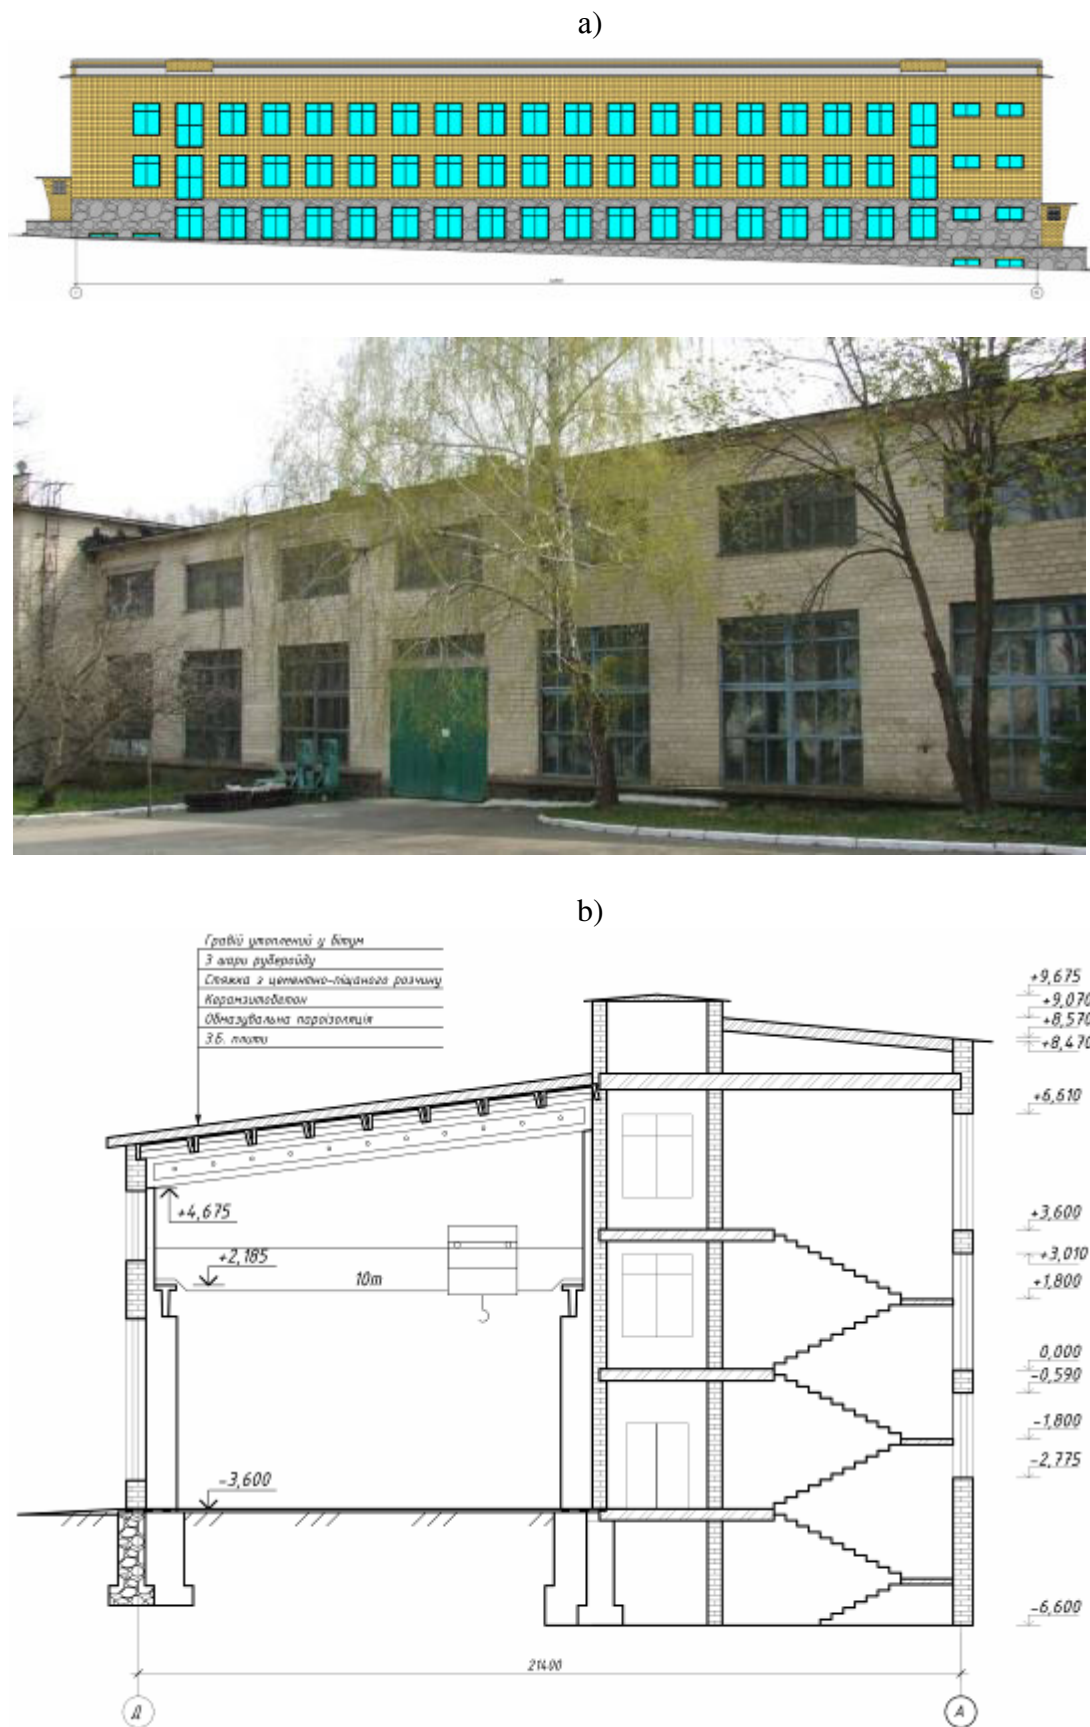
Front elevation and overall view (a) and sectional elevation (b) of «L» teaching block before reconstruction
